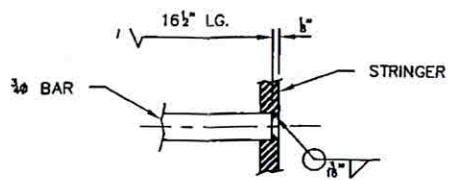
DETAIL @ PIPE SUPPORT BRK'T. "B" (2) REQ'D.
